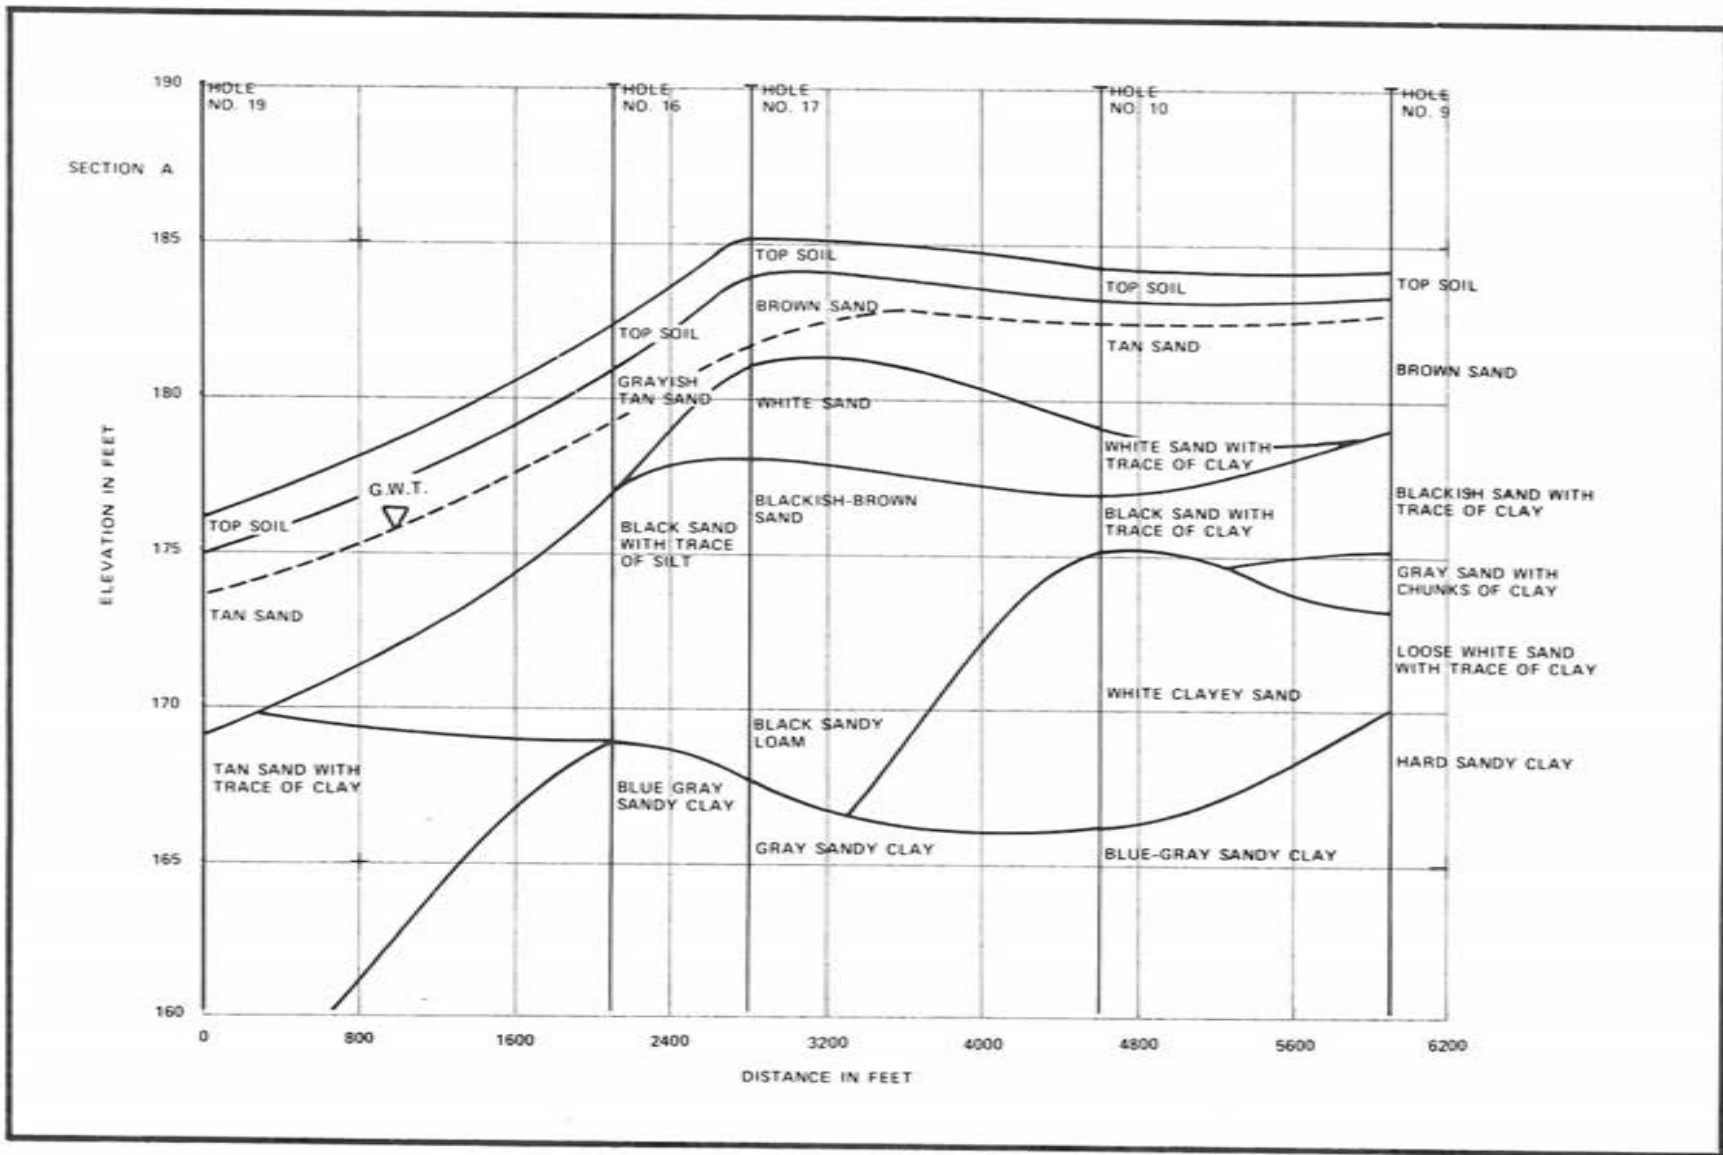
INFERRED STRATIFICATION IN SELECTED CROSS-SECTIONS OF DEERHAVEN SITE.
